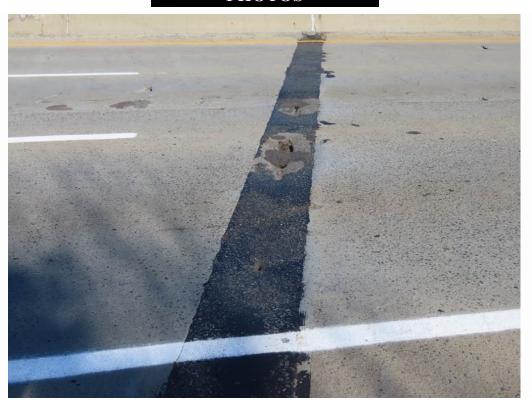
Overview of pier 2 joint looking north. Settled holes in right and center travel lanes. Pier 1 joint is similar.
